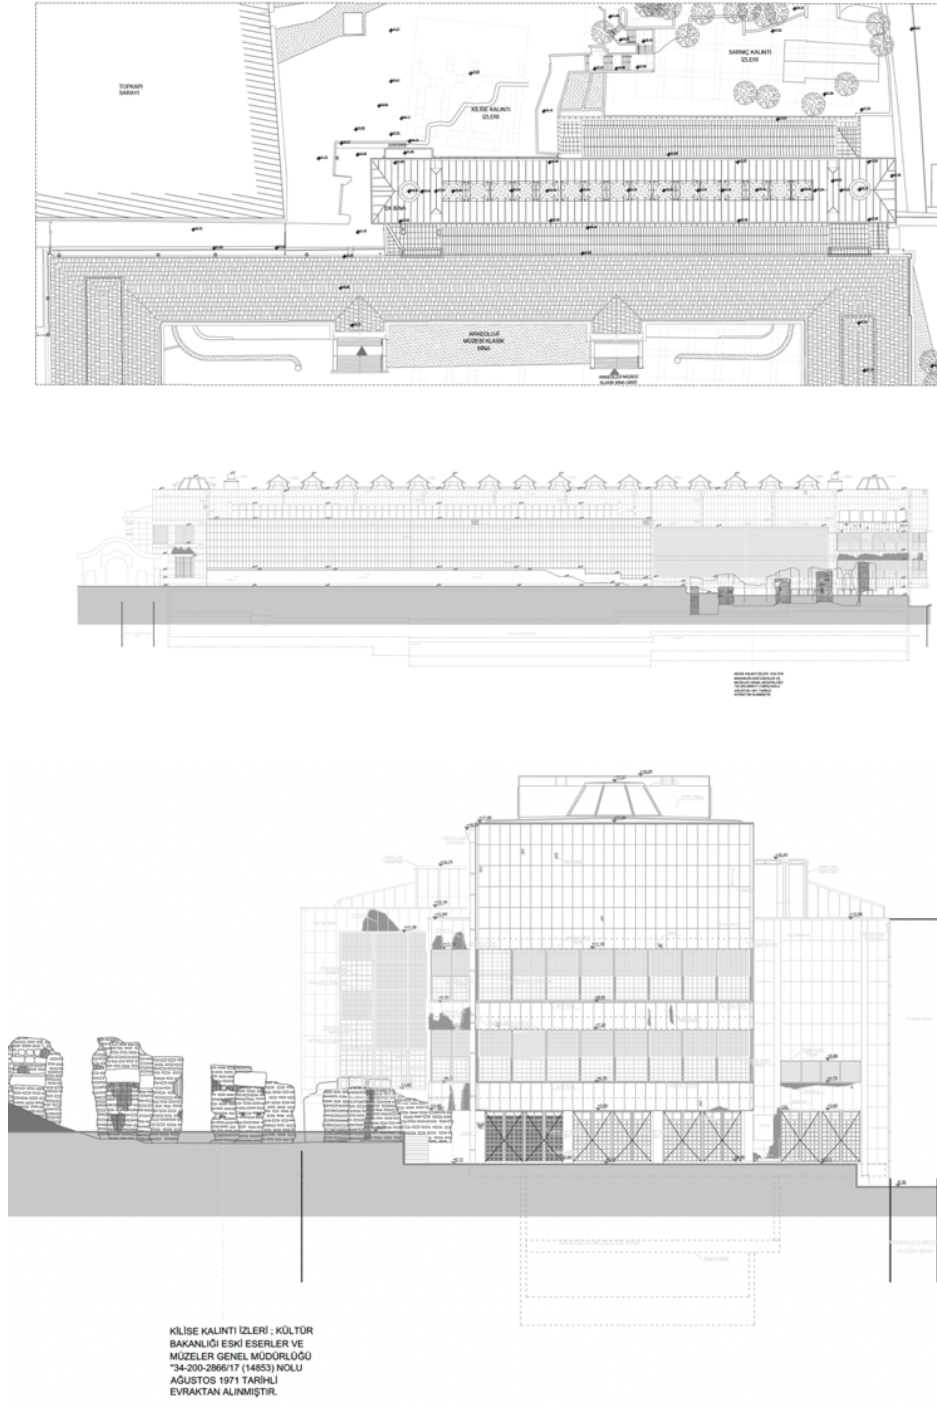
(Top) The key plan of Additional Building (Middle) The south elevation of Additional Building (Bottom) The east elevation of Additional Building (drawn by *YD Mimarlık* source *IDS*M Archive)
